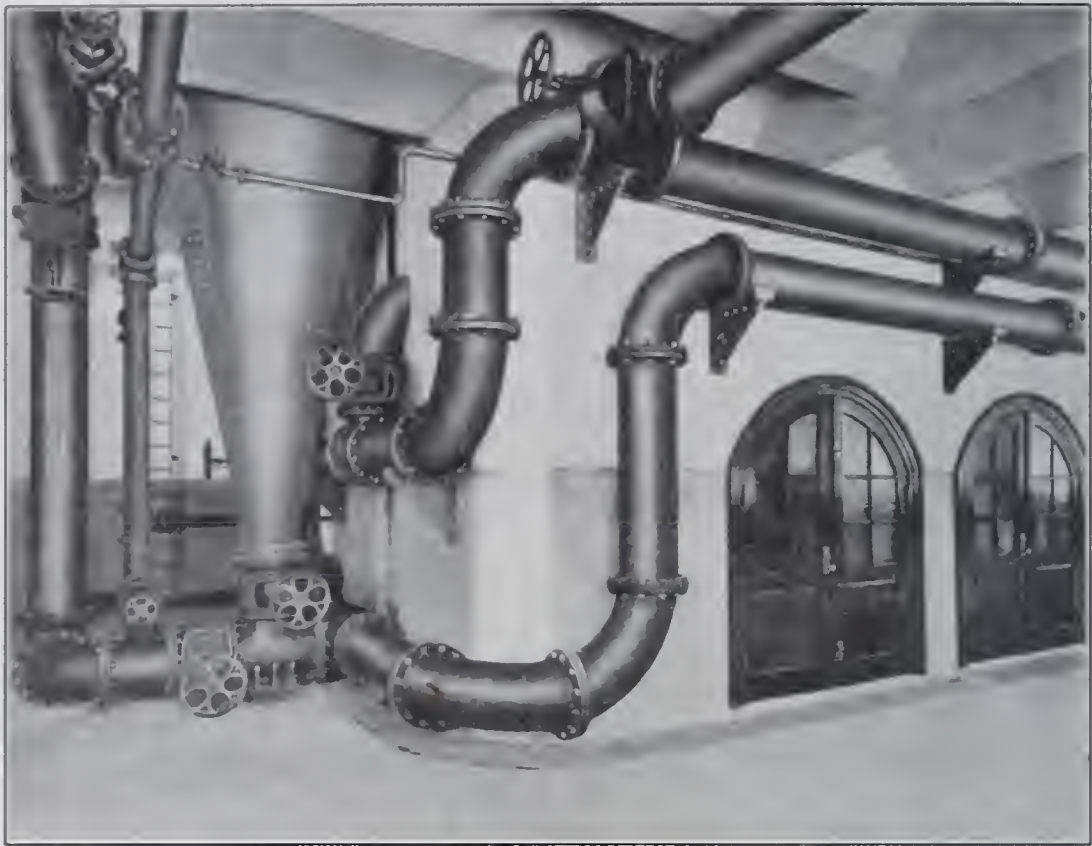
CONICAL BOTTOM SECTION OF PRESSURE TANK; STAND-PIPE AND PIPING SYSTEM, AND BASEMENT OF HYDRAULIC LABORATORY.
